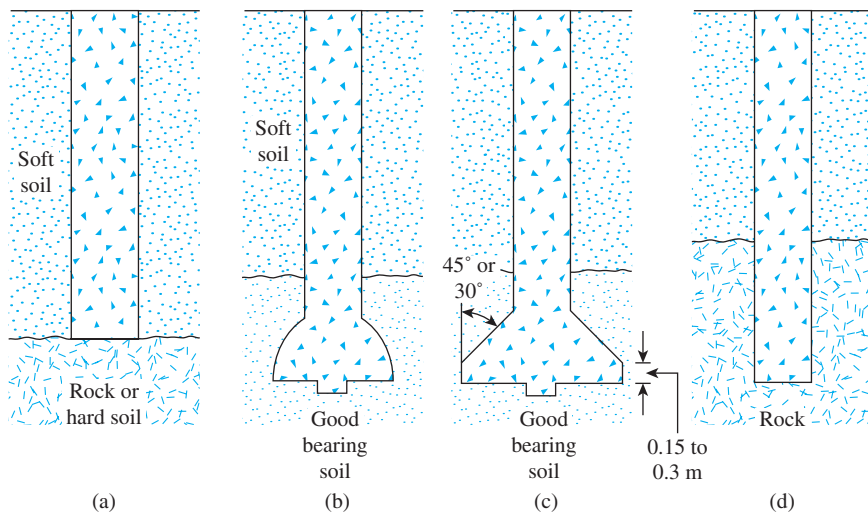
Types of drilled shaft: (a) straight shaft; (b) and (c) belled shaft; (d) straight shaft socketed into rock
